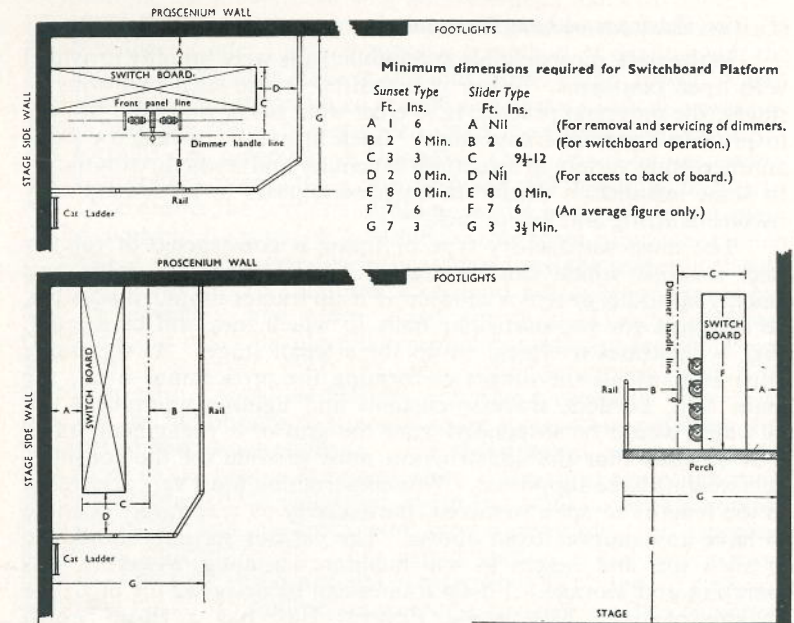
Above is a typical switchboard installation in plan with the board parallel to the proscenium arch. Left gives an alternative arrangement wherein the switchboard is parallel to the side wall of the stage. Where local conditions permit, the former arrangement is much to be preferred as it allows the operator a better view of the stage, at the same time keeping the side walls clear for counterweight systems, scenery packs, etc. Right shows a side view of either of the foregoing arrangements. Although the switchboard is shown on a perch or platform, the dimensions given will apply equally if it is situated at stage level.
